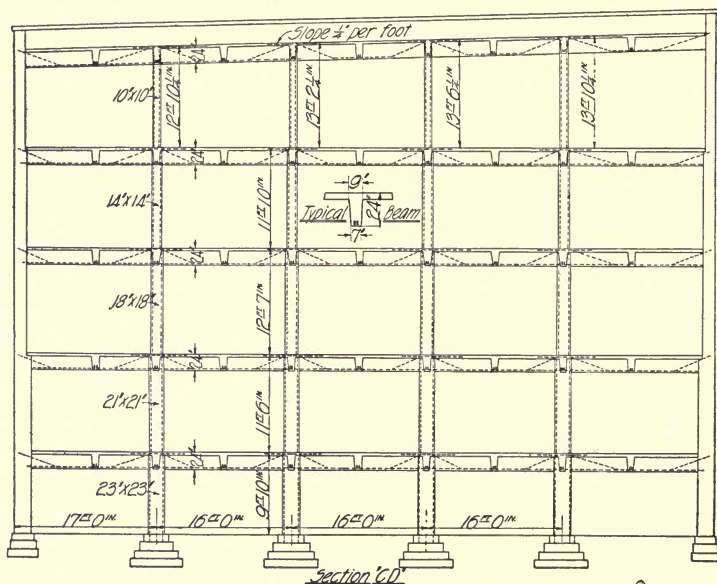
Cross-Section of Forbes Cold Storage Warehouse.
